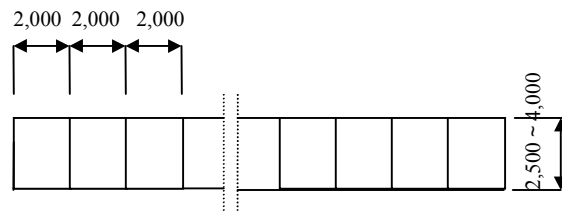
Preliminary Plan of Ticket Windows
